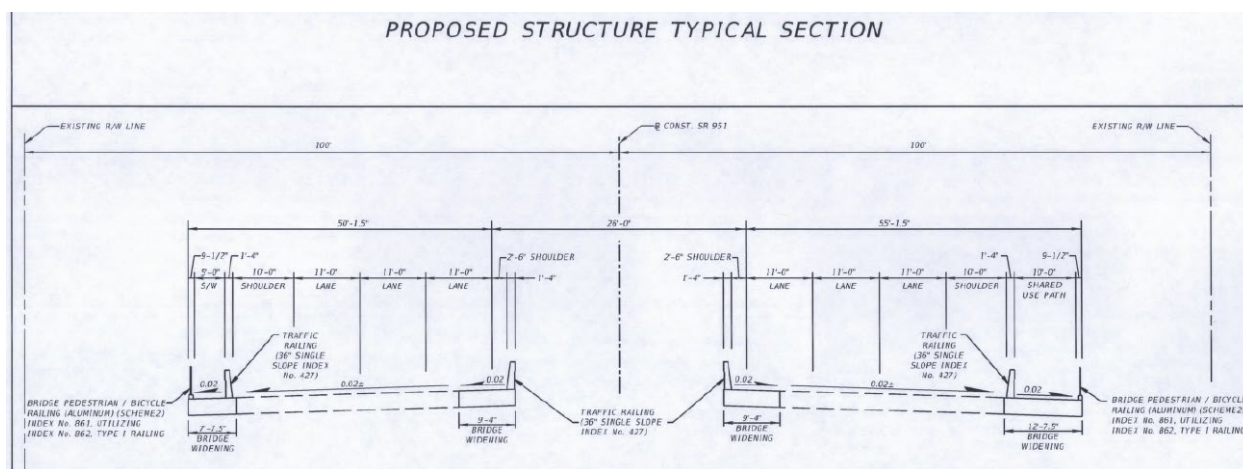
Proposed Typical Section for the Henderson Creek Bridge (FPID 435111-2)
